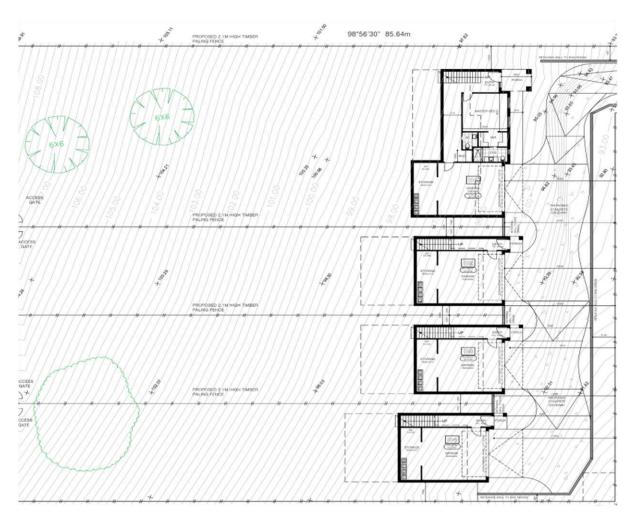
GROUND FLOOR PLAN (SOURCE: PLANFORM BUILDING DESIGN)
